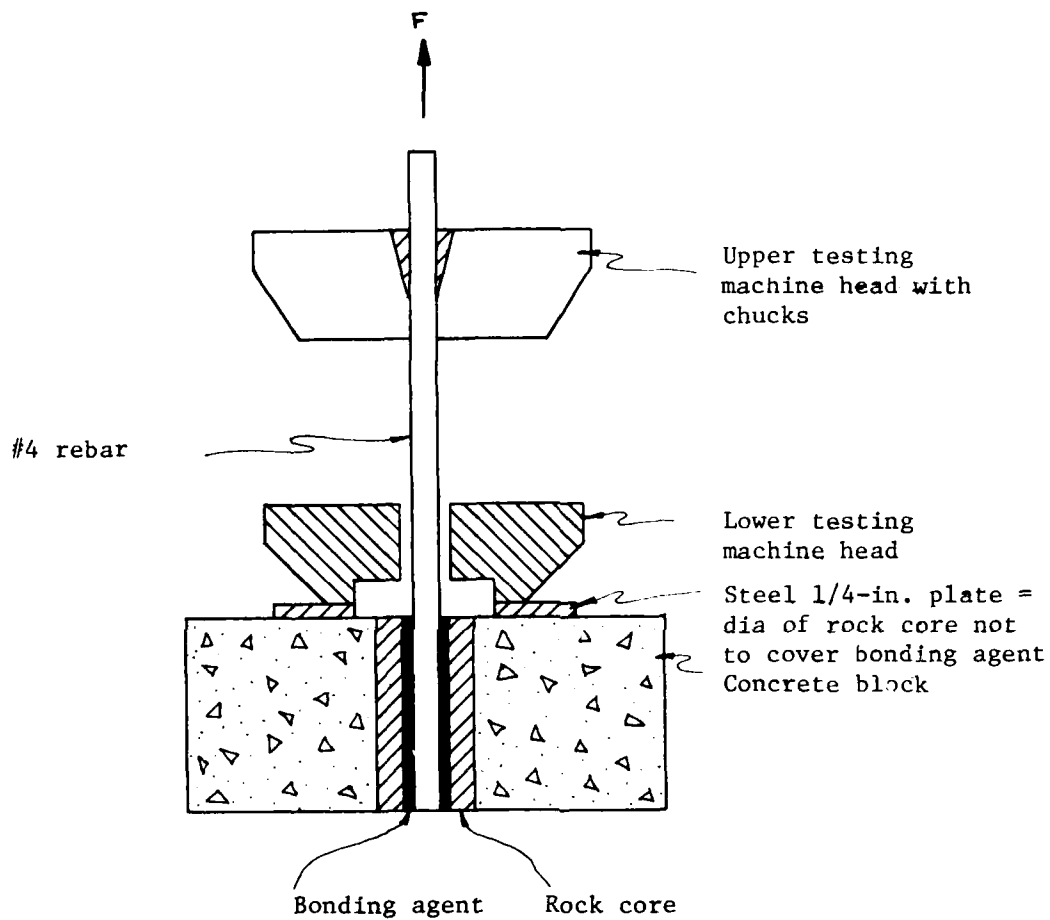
Section showing test configuration for the reinforcing bar pullout tests
